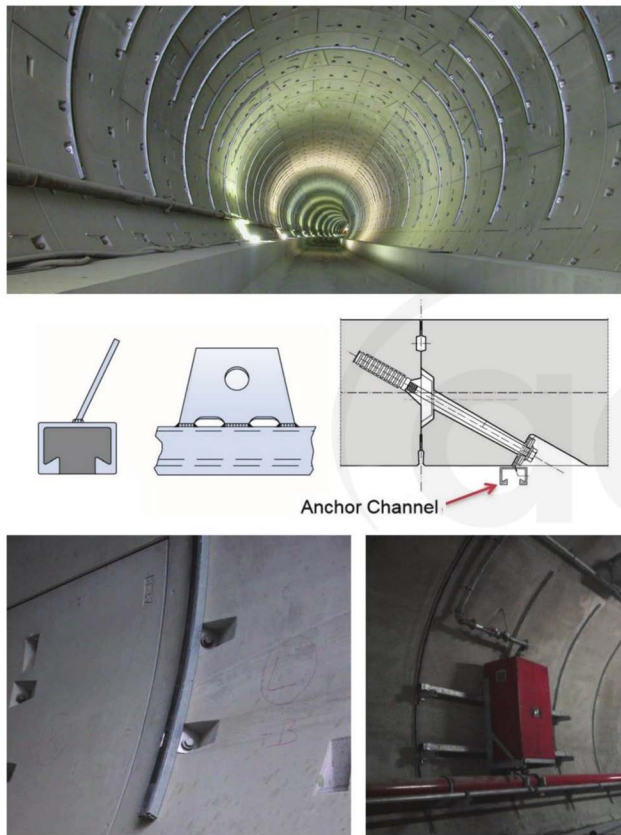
Post-installed fastening system without drilling and through curved channels anchored into segments using connection bolts and mounting plates at the back.
